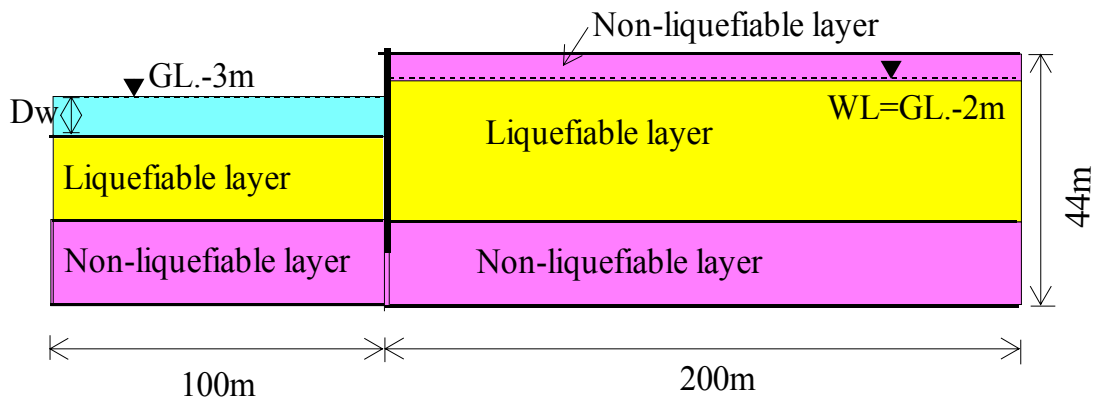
Typical cross section of sheet pile type wall in Tokyo
